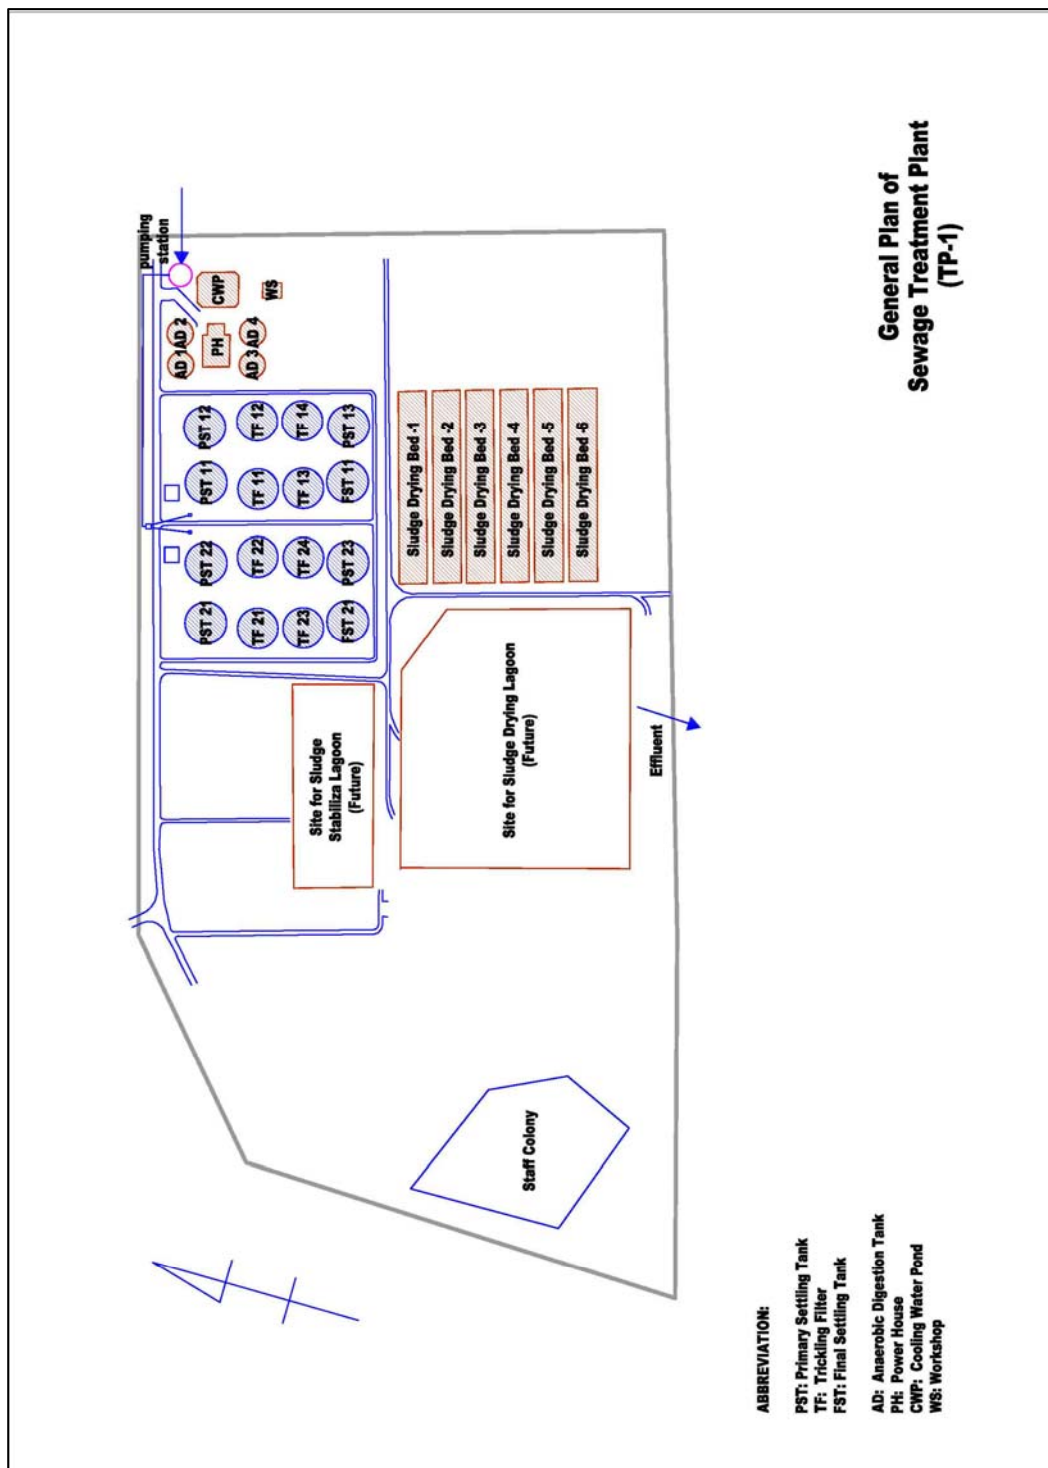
General Plan of Sewage Treatment Plant TP-1
